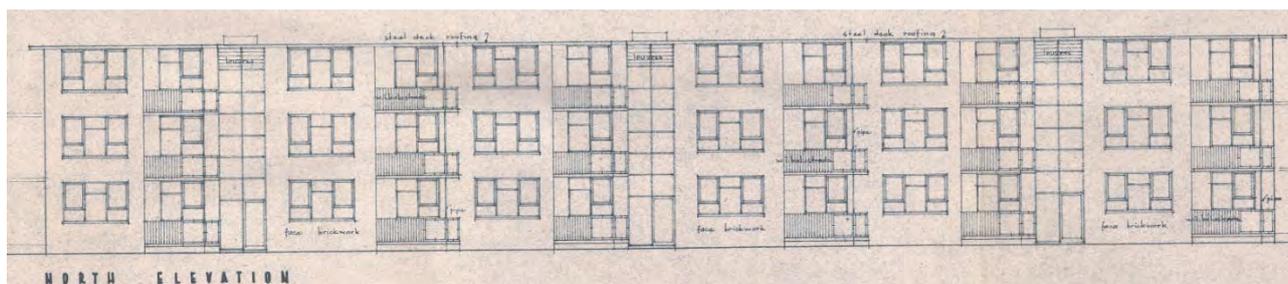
1960 drawings, north elevation (Source: Building File)
